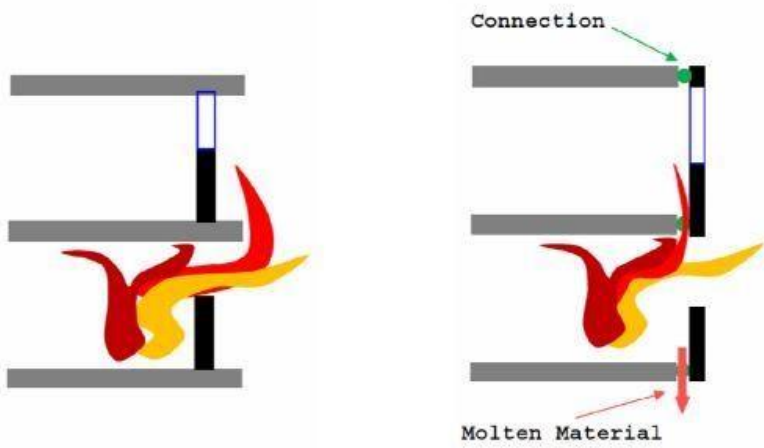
(a) Fire spreading from origin of the floor to all above floors
